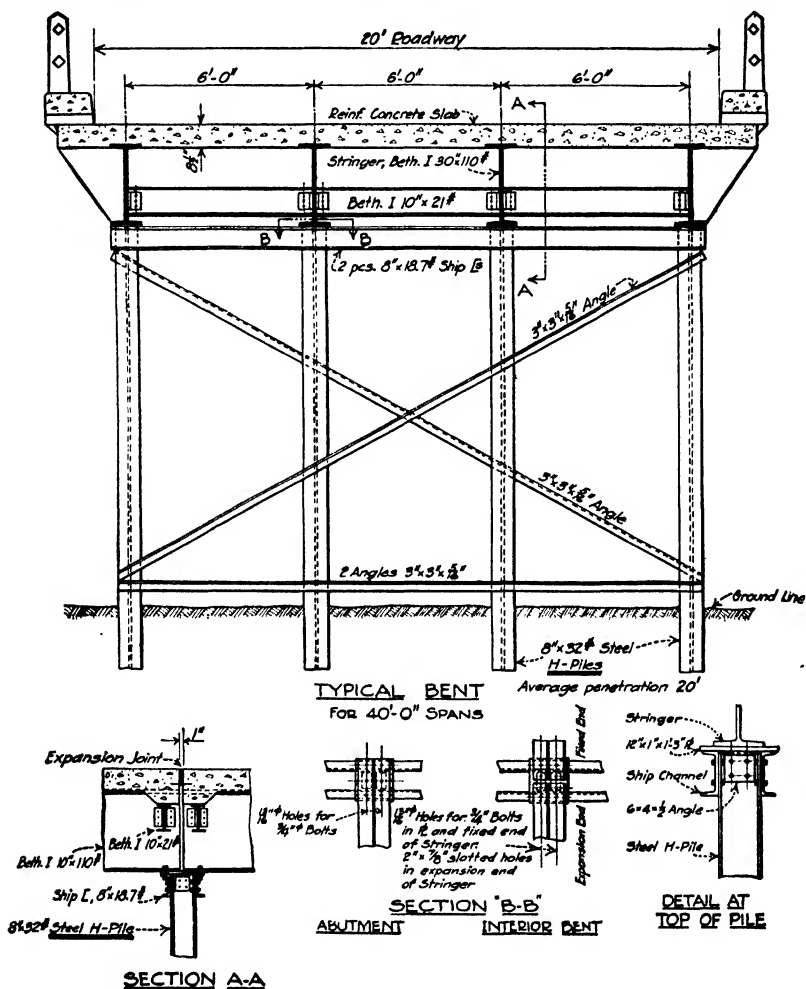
Steel-pile Bent of Ponchorico Creek Bridge, Monterey County, California. (Courtesy of Bethlehem Steel Co.)
